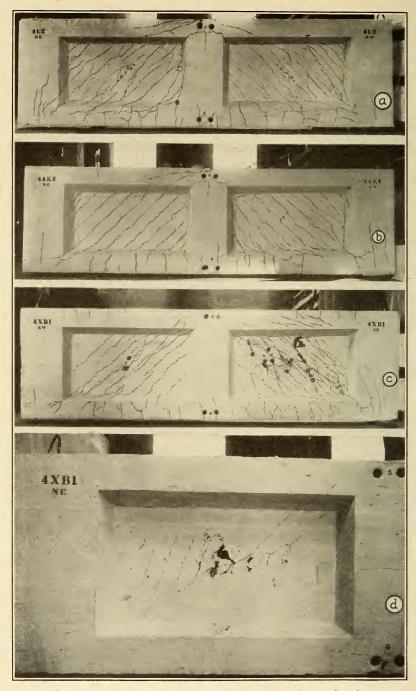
Diagonal tension failures of beams with 3-inch webs
